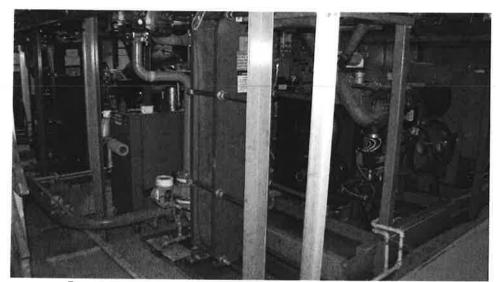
Jacket Coolant Heat exchangers (installed in 2008)
